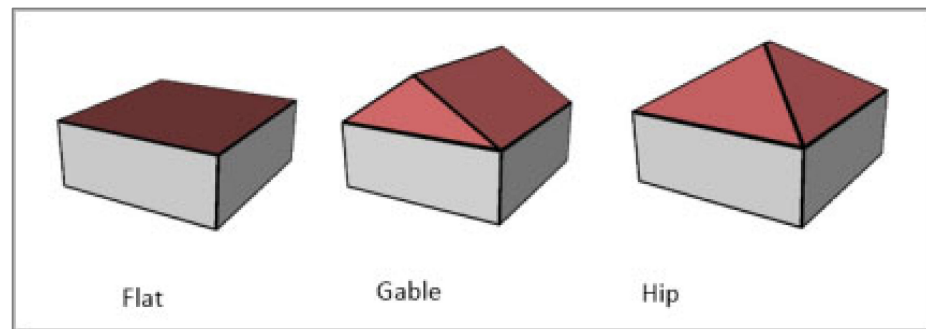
Different roof shapes with the same building footprint. Source: ESRI.
